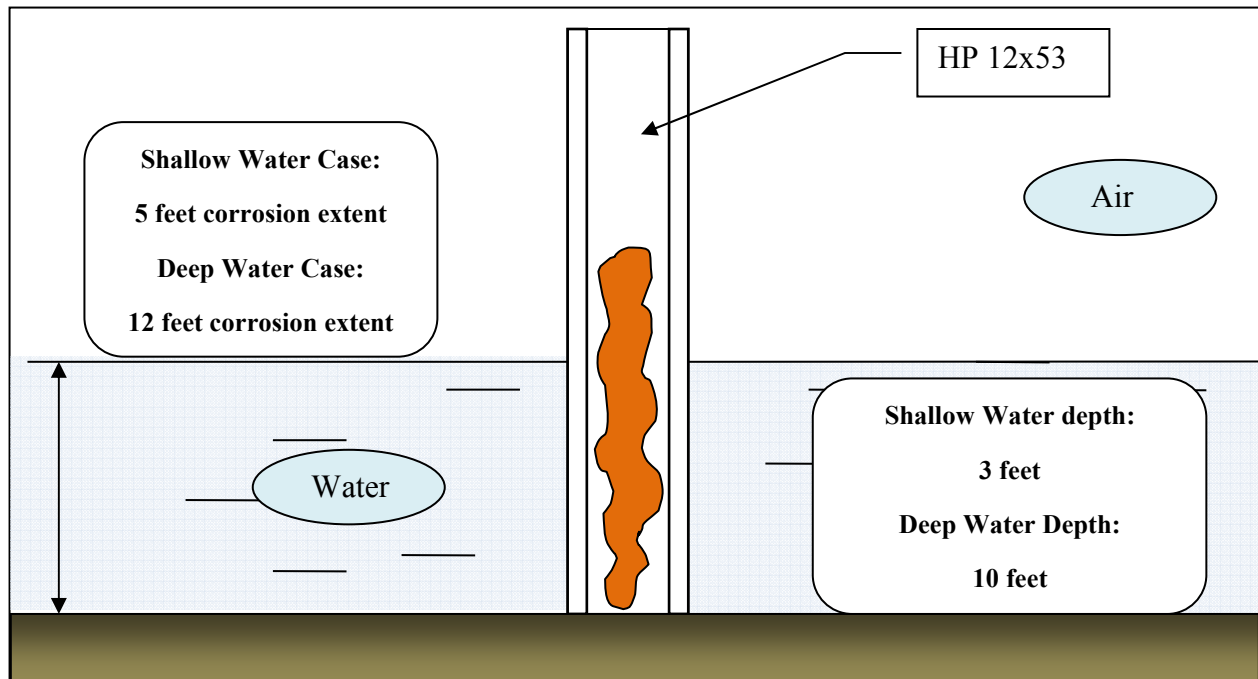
Corroded Steel Bridge Piles (Deep Water Case and Shallow Water Case)
